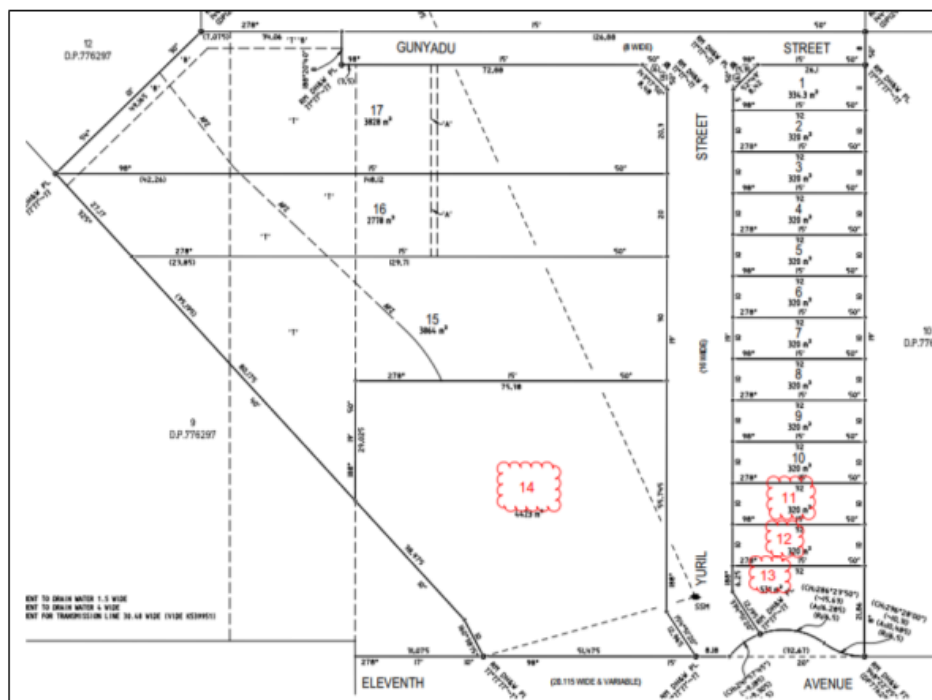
Proposed Subdivision Plan (Source: Stephen Craig Bishop)
